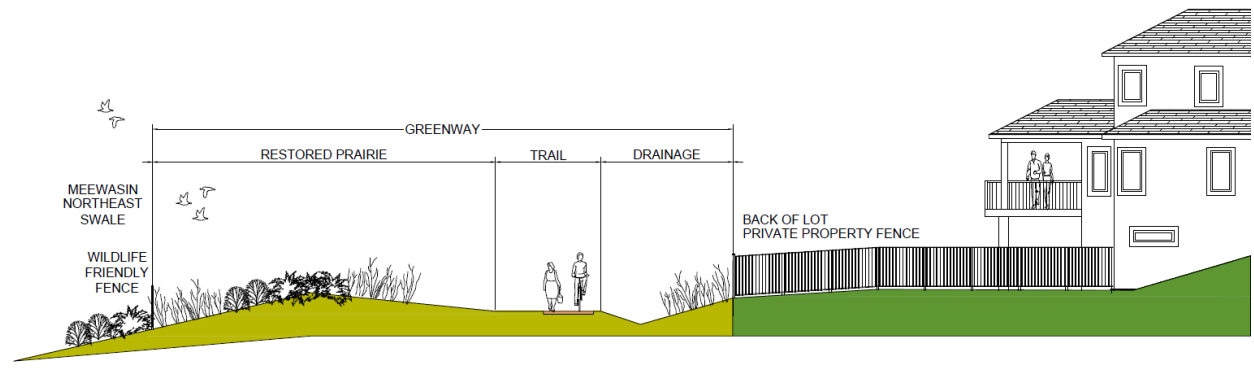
THE GREENWAY – CONCEPTUAL LAYOUT
